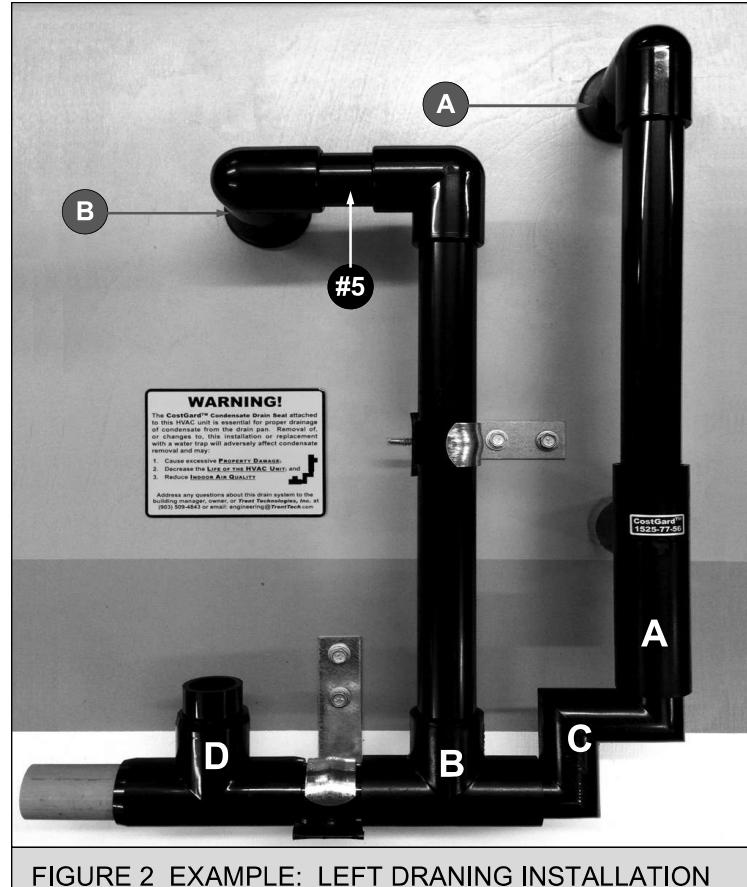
EXAMPLE: LEFT DRAINING INSTALLATION
